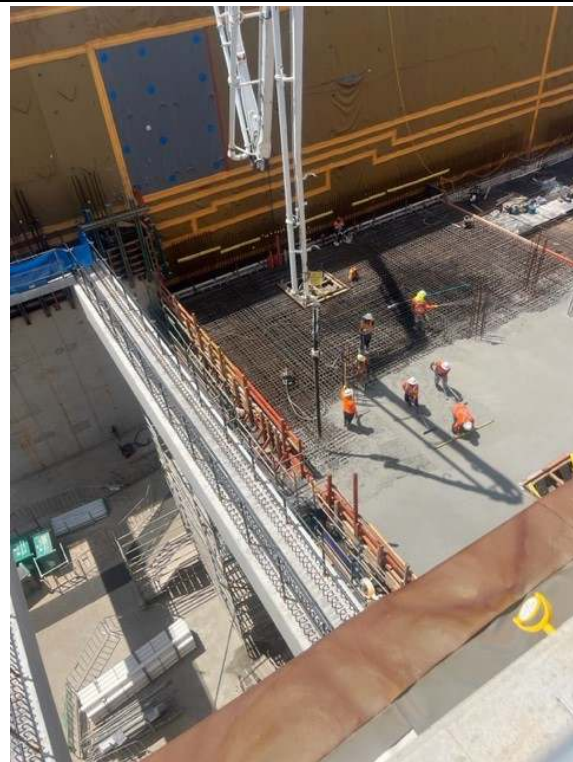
Open shaft to the Sydney Metro WSA tunnel
